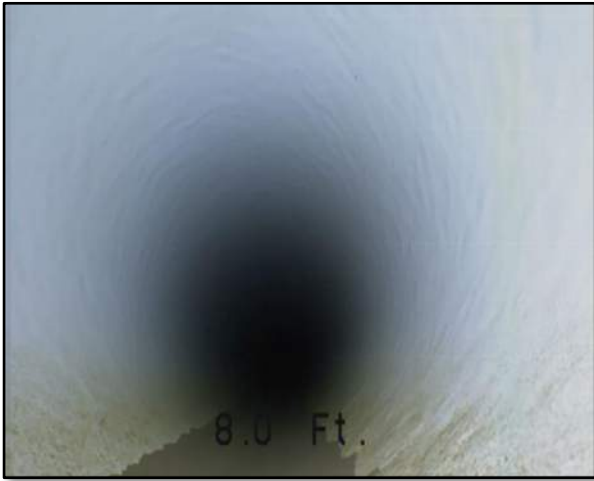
STA 00+08: Pipe is in good condition (typical).
